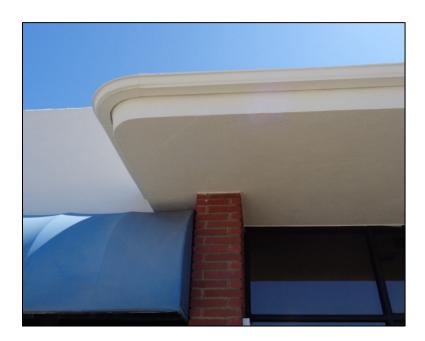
Cannery Block, north elevation, detail showing office building with curved cantilevered porch hood, camera facing west. ICF, 2019.
